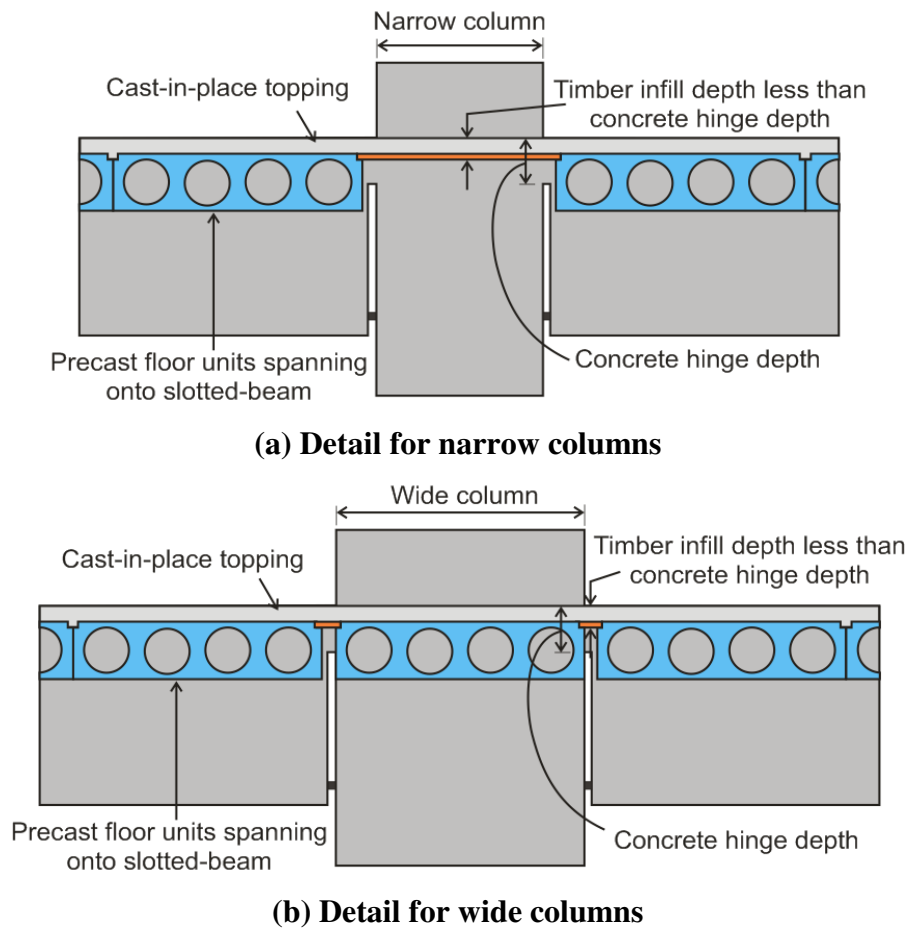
Proposed floor slab-to-beam connection details for precast floor units spanning onto slotted-beams
